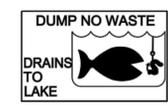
PLATE SHALL BE ADDED TO STORMWATER INLETS AS REQUIRED BY THE CITY.
